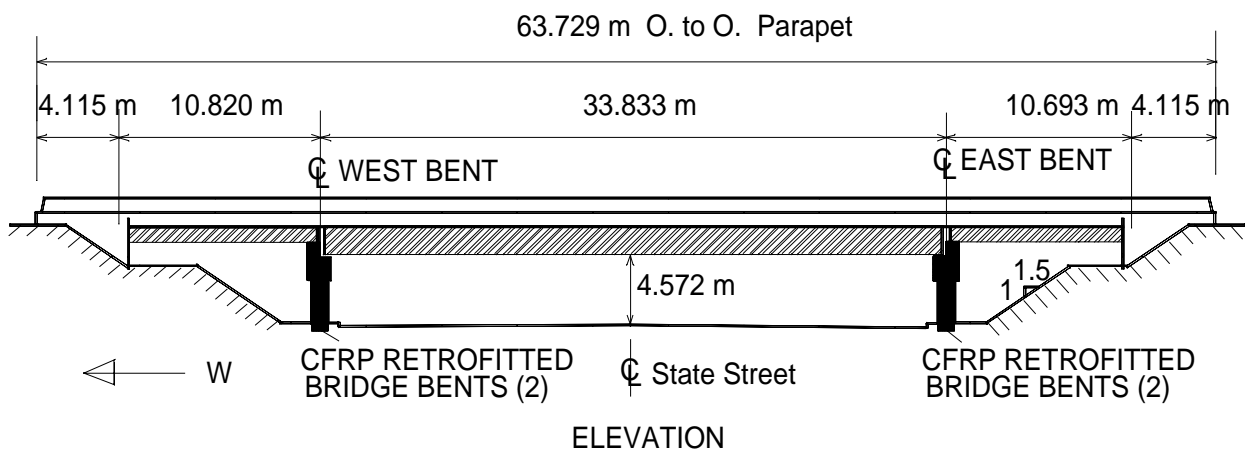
STATE STREET BRIDGE ELEVATION SHOWING THE FOUR BENTS RETROFITTED WITH CFRP
